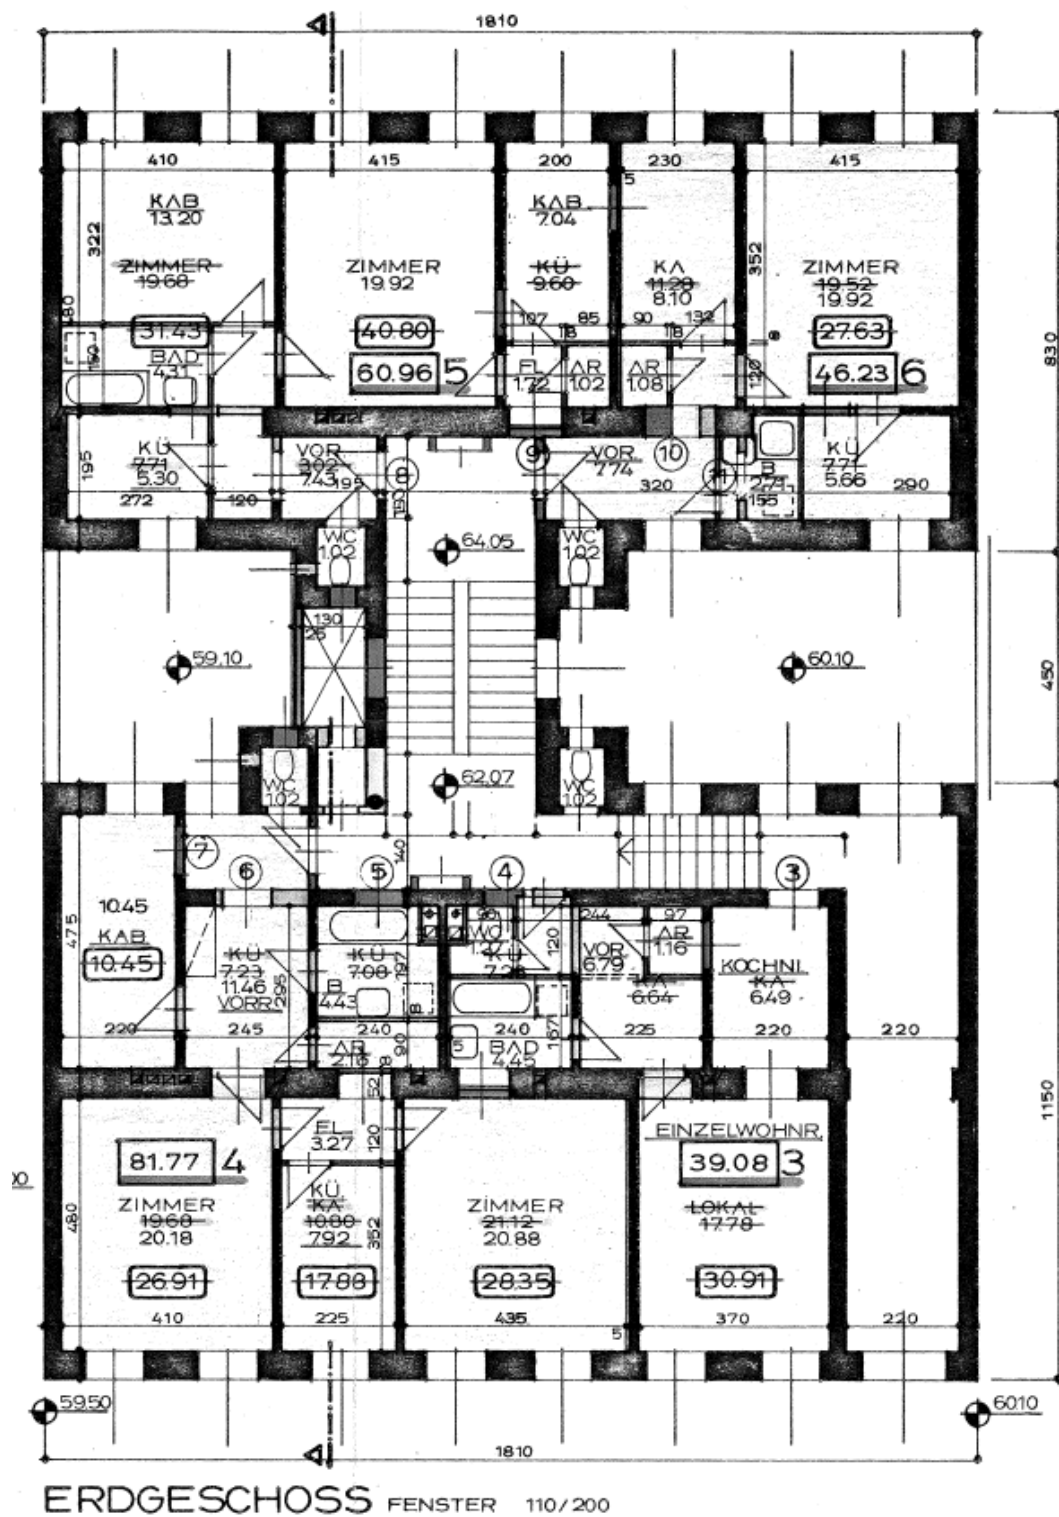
Plan of the first floor of a building in Habichergasse 20, Vienna
